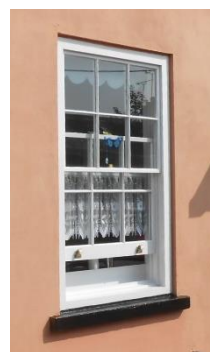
2006 single-glazed timber sash window at No. 132
